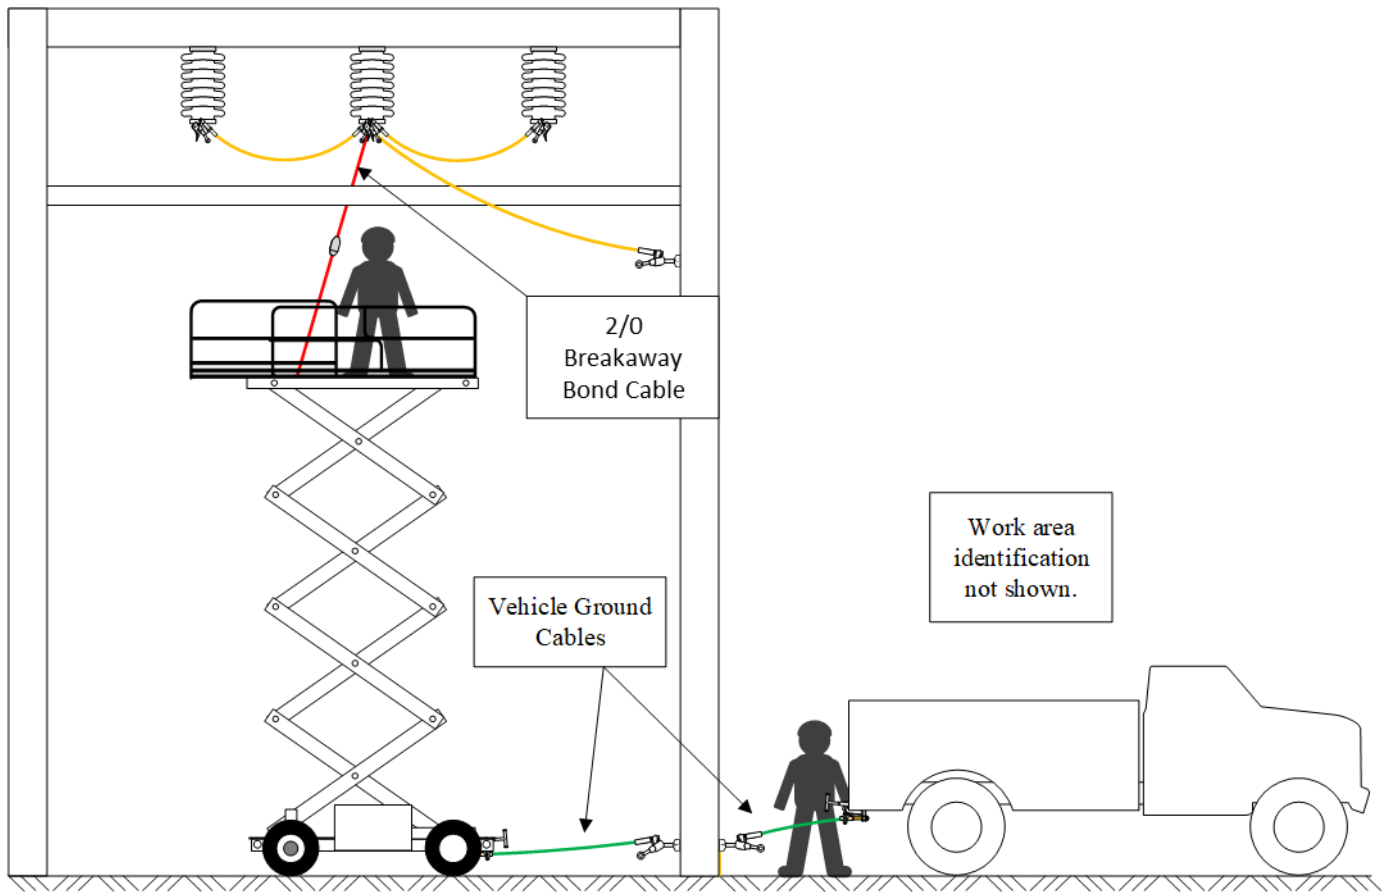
Example of a Grounded & Bonded Aerial Lift
